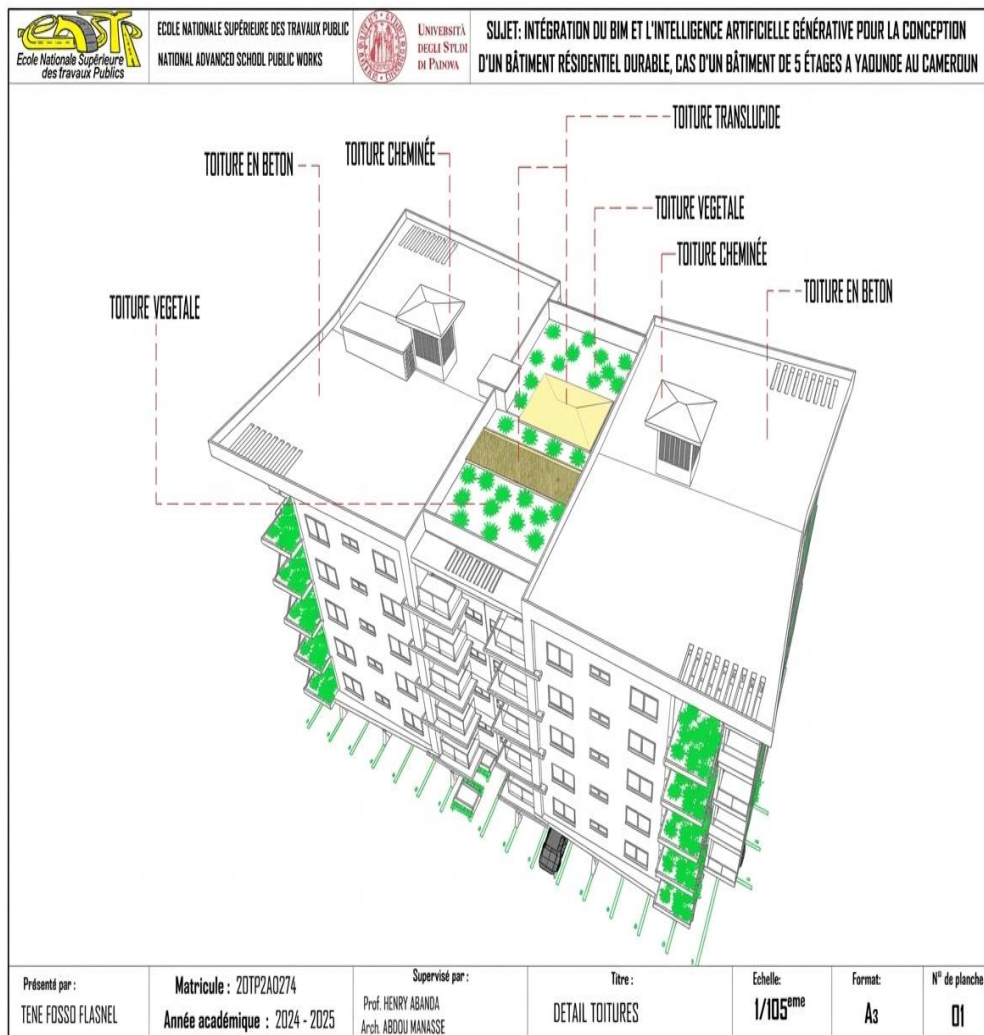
Composition of the building's four-part multifunctional roof system: translucent roof, planted roof, concrete roof and climatic-chimney caps. (Source: Tene Fosso, 2026.)
